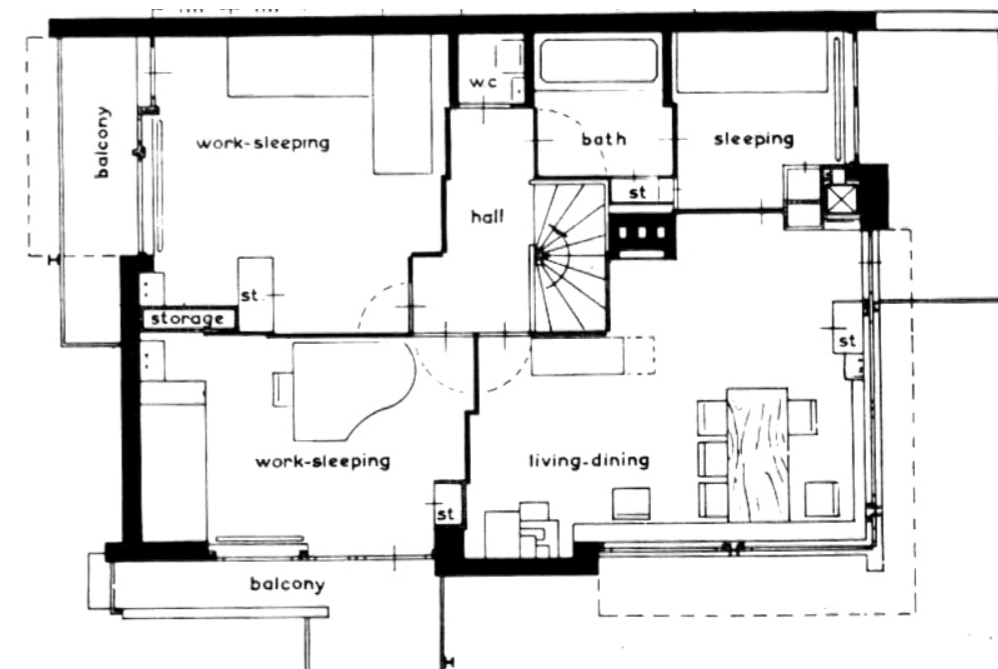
Schröder Huis first floor plan (Gerrit Rietveld, 1925)
